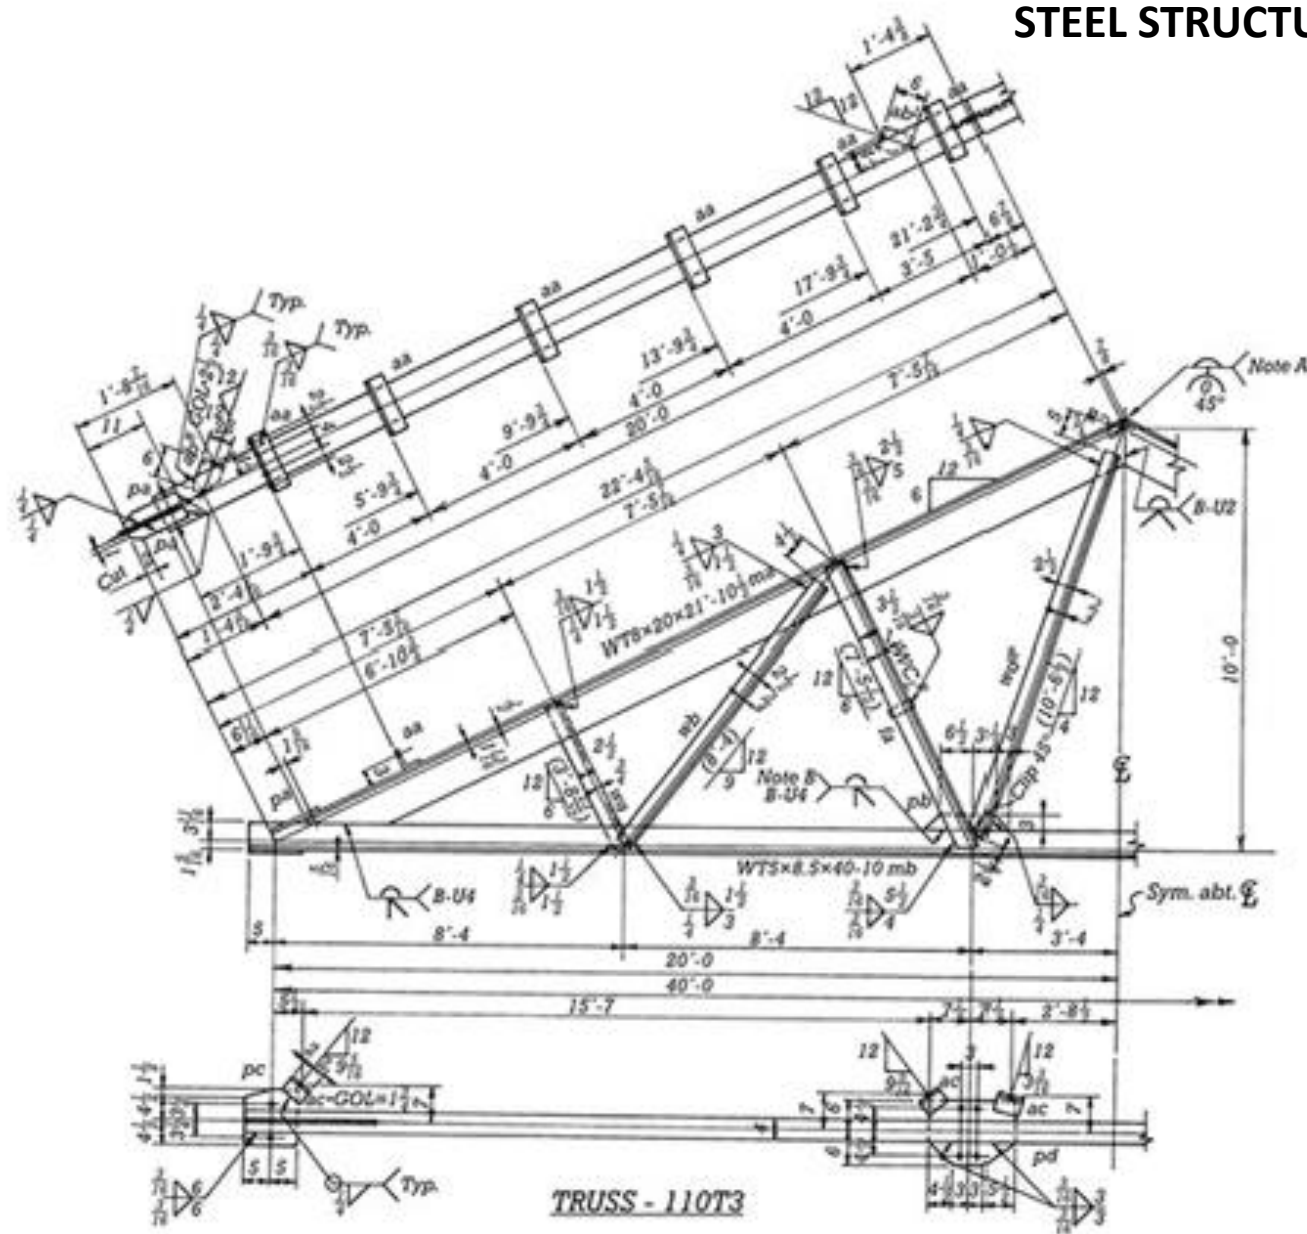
A fabricator's shop drawing of a welded steel roof truss made of tees and paired-angle diagonals.
